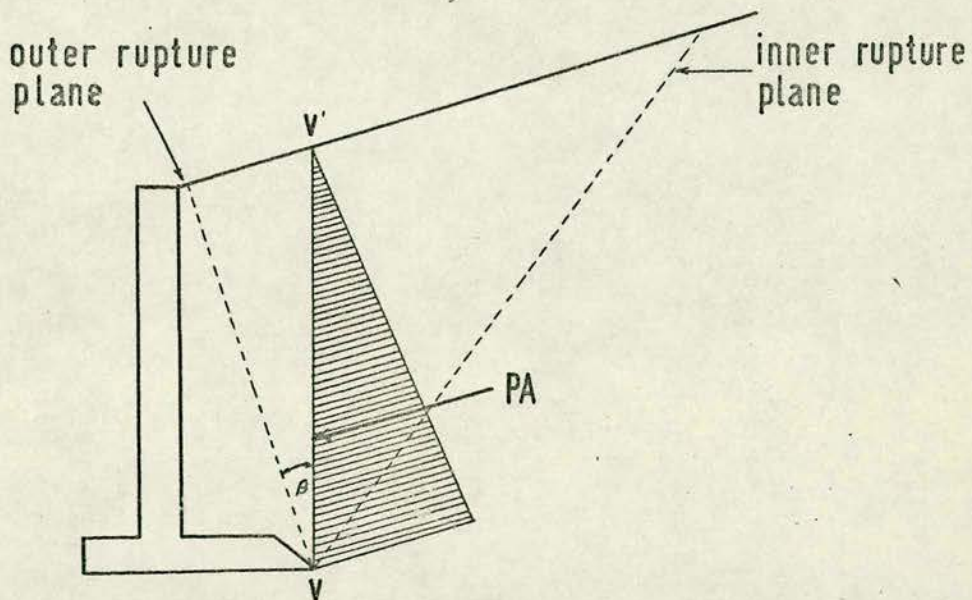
RANKINE'S METHOD FOR CANTILEVER WALLS
